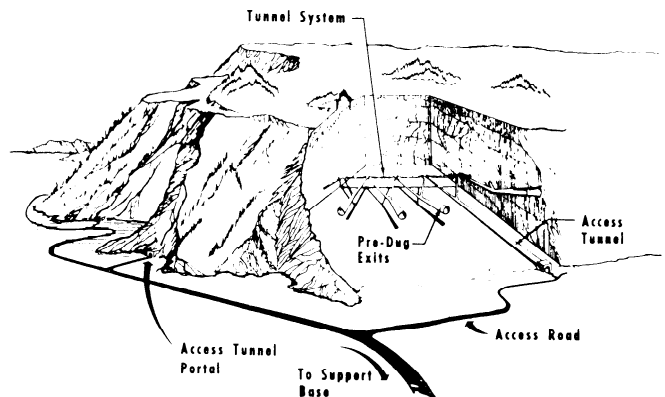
Cutaway view of an artist's concept of a deep underground missile base (permission: DNA).
